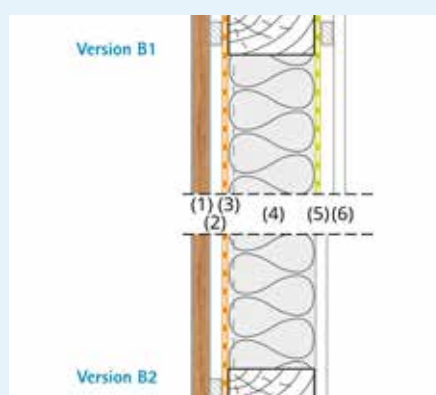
Wall construction B (1) Timber weatherboards, 19 mm; (2) Drainage cavity, 20 mm; (3) Wall wrap, SOLITEX EXTASANA®; (4) Insulation, 90 mm; (5.1) No airtightness layer (B2); (5.2) Airtightness layer INTELLLO® PLUS (B1); (6) Gypsum plasterboard, 10 mm
